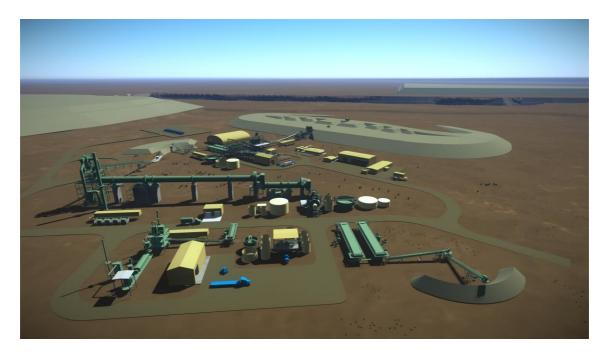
Plant Layout (Aerial view looking east. Processing plant in the foreground, IWL to the left (north). The ROM blending stockpiles are visible behind the plant and the Gabanintha open cut (3.2 km long) is in the background. A second waste dump is located east of the pit.
